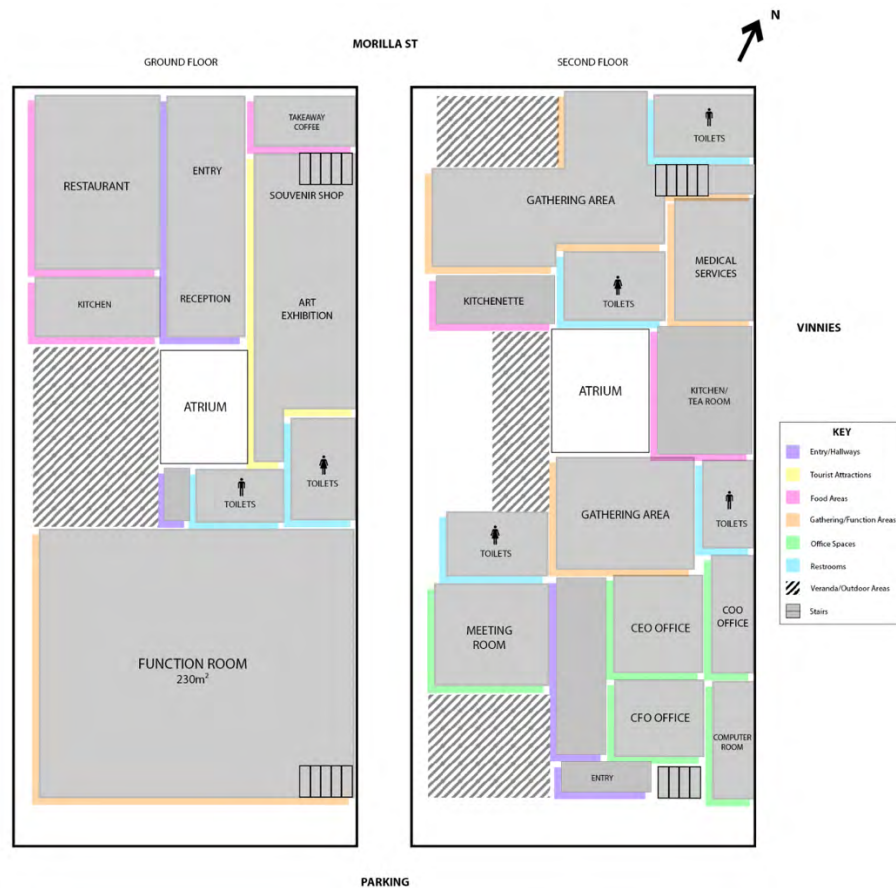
Initial Design Floorplan used in Highlighting Spatial Issues
